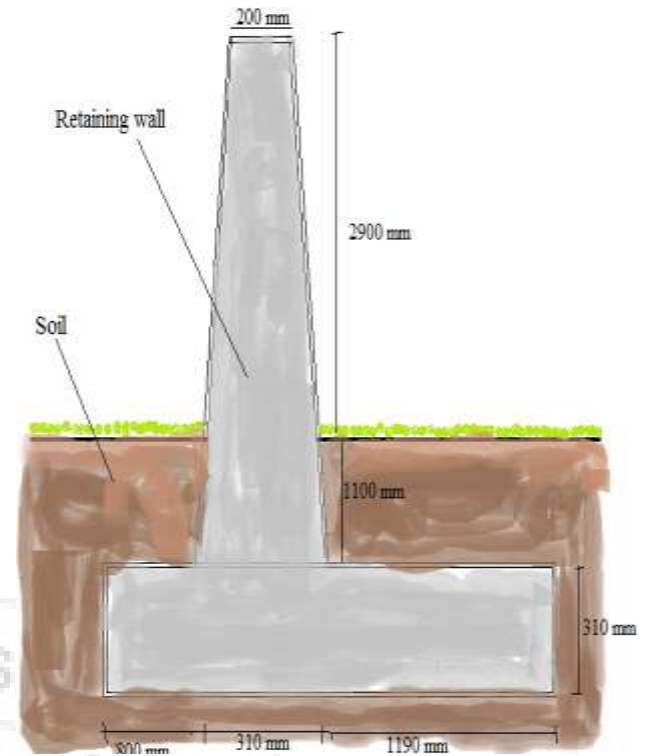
(a). Design of Cantilever type RCC retaining wall of 4m tall stem
